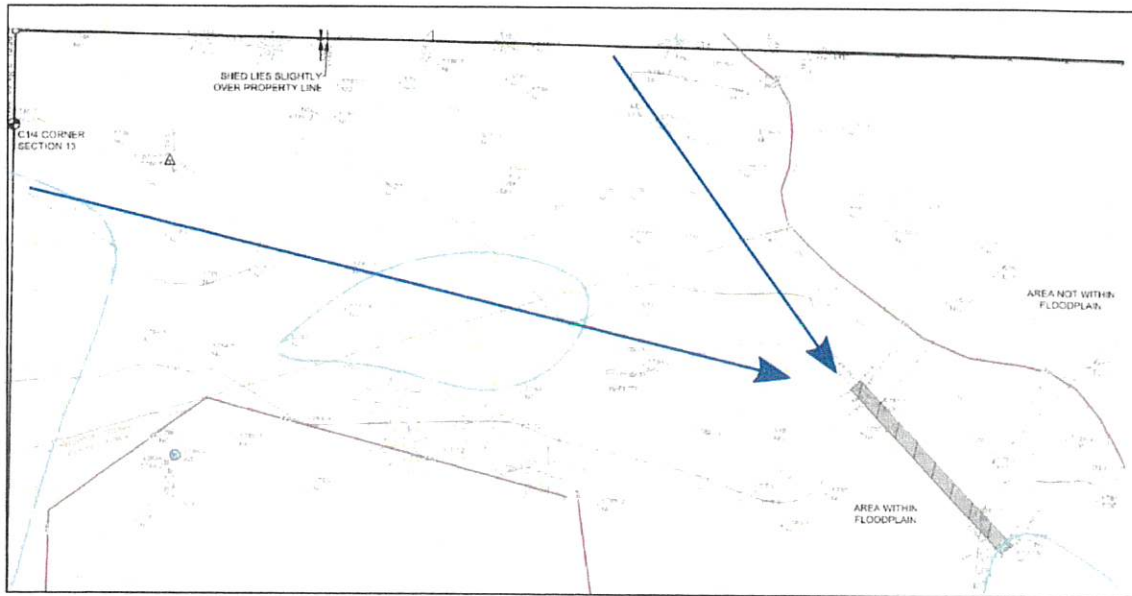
Existing conditions topographic survey map showing drainage patterns (highlighted with blue arrows). Basemap Source: Galena Engineering, Inc.
